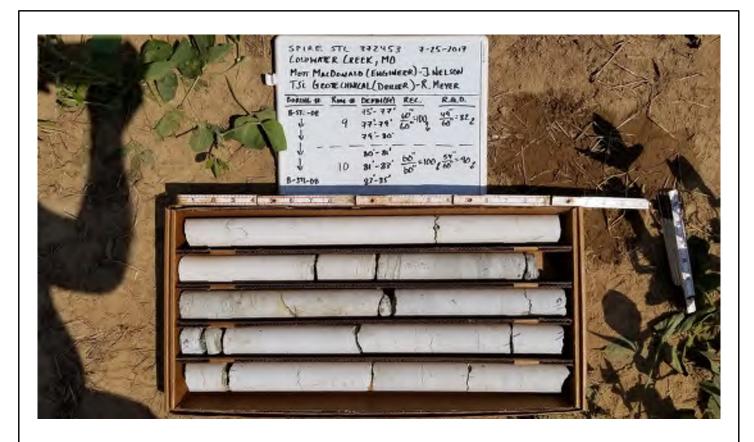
B-STL-8 Box 5 Runs 9-10 Dry
